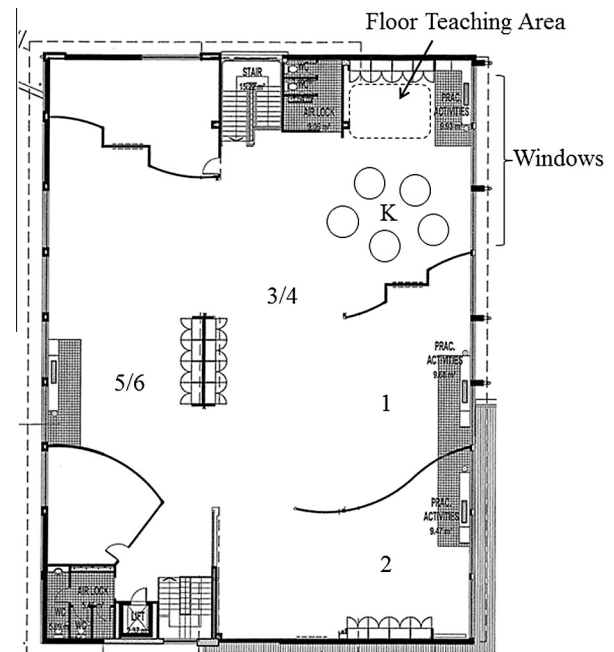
Floor plan of the K-6 classroom with 205 students.
